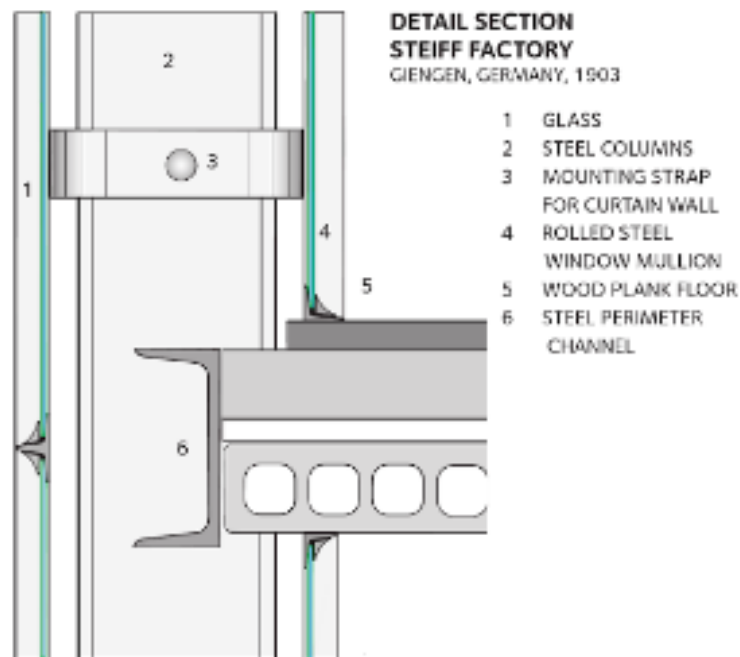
Developed Architectural Detail shows the new construction developments (Fortmeyer & Linn 2014)
